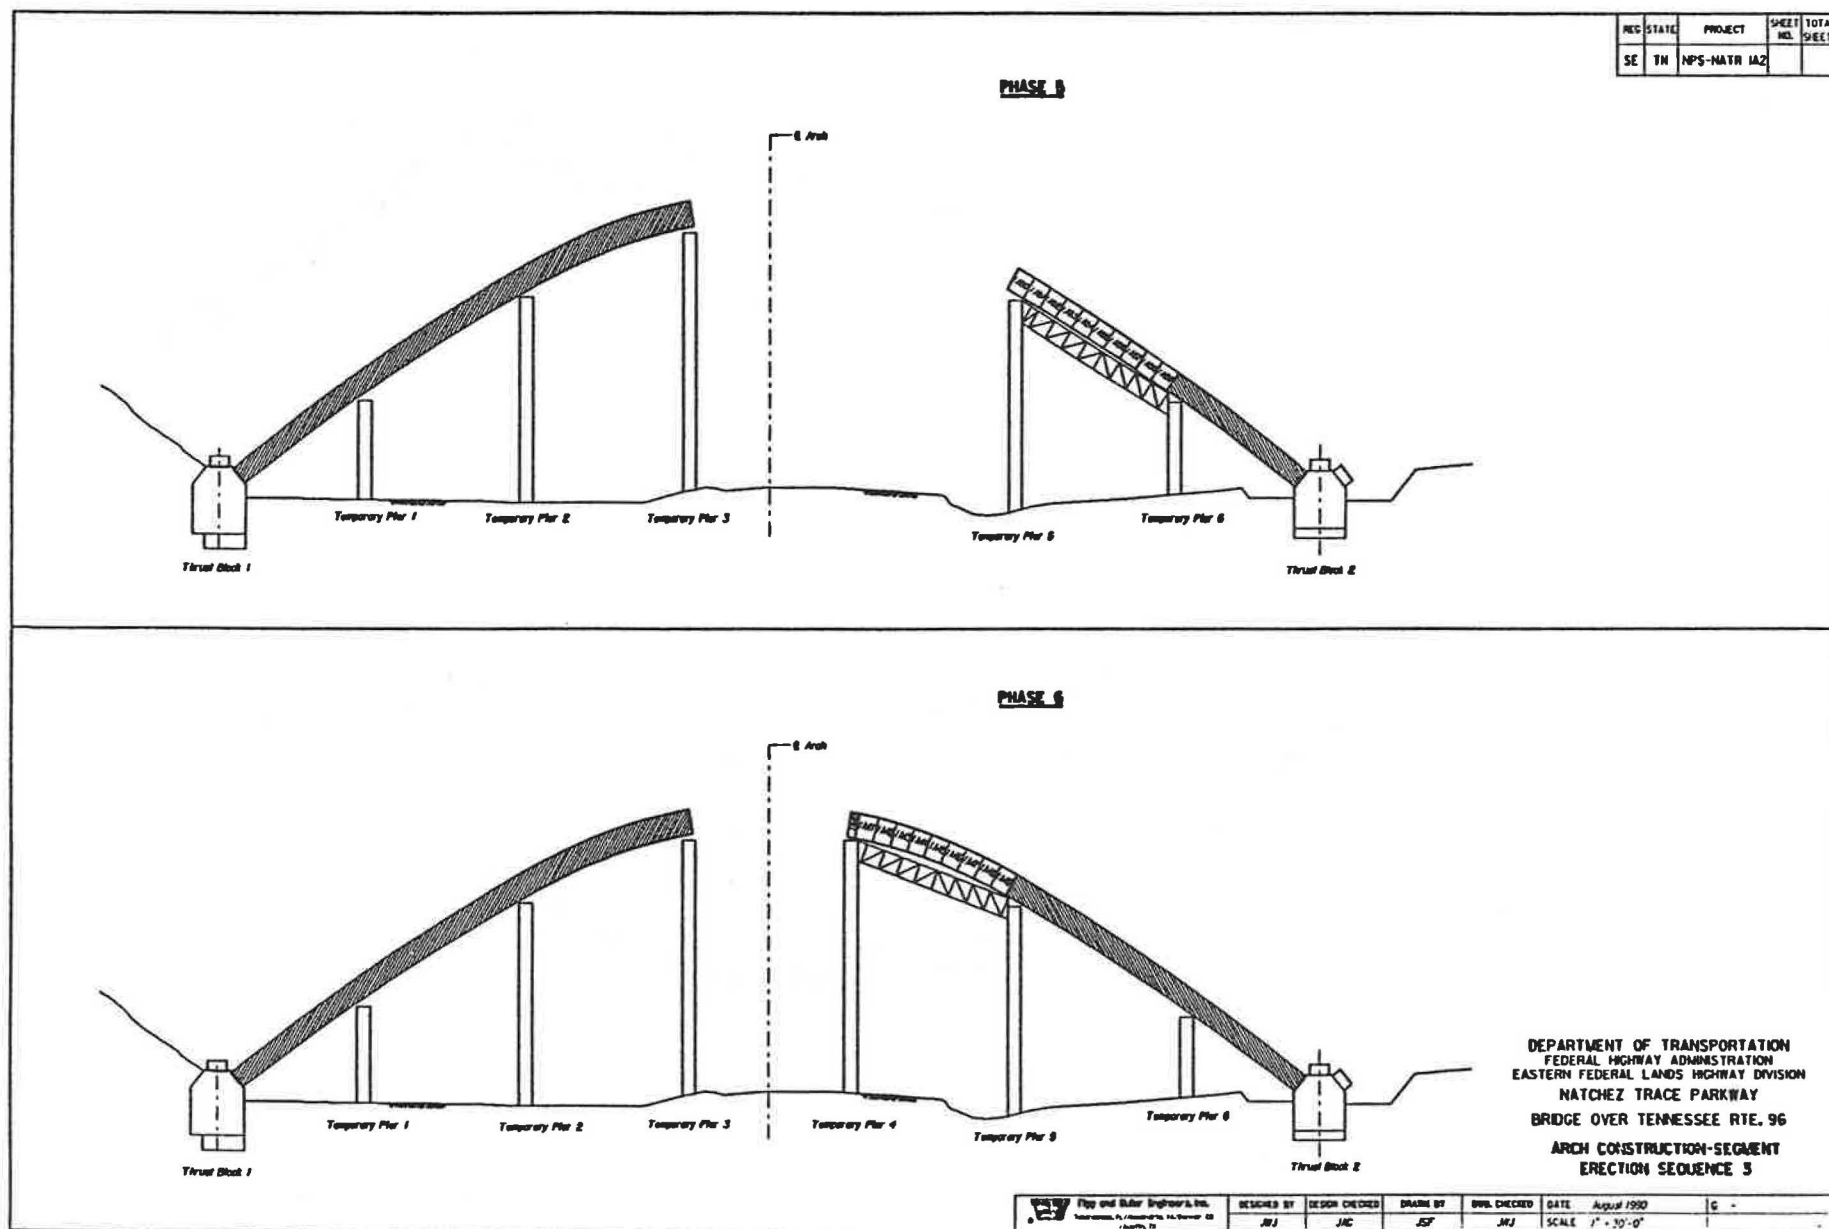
Arch construction - precast alternate - phases 5 and 6
